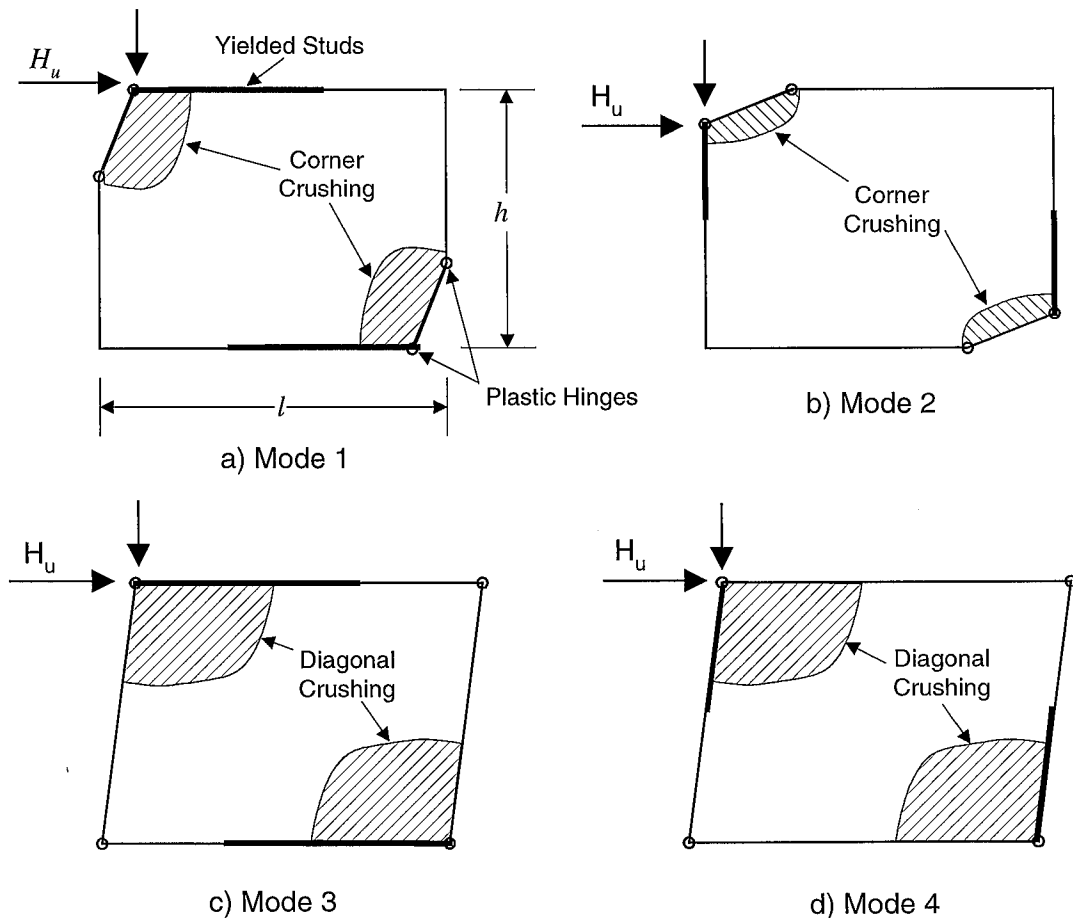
Failure Modes of a Single Story Infilled Steel Frame Having Interface Connectors [after Liauw and Kwan (1983)]
